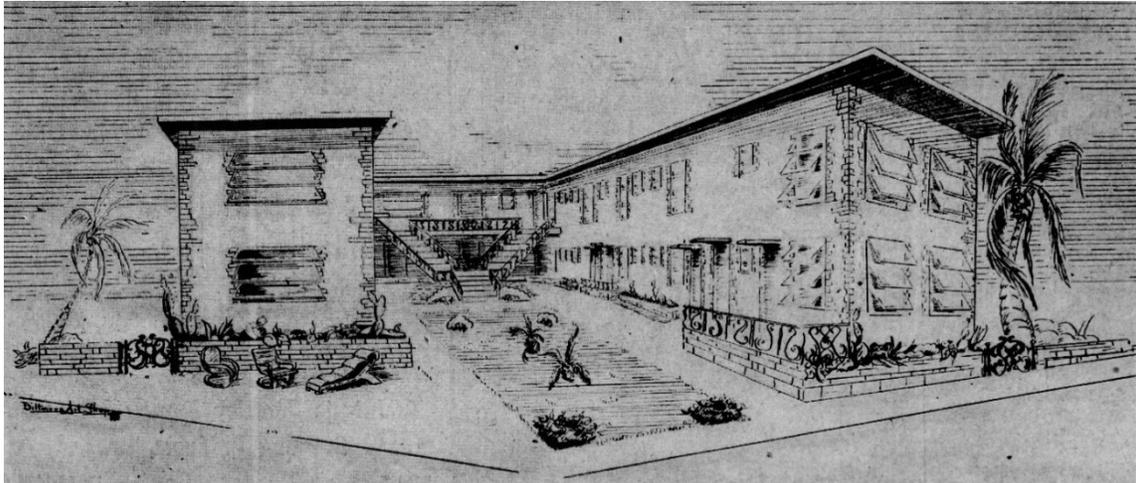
Rendering of apartment building at NE 1st Place, between 83rd and 84th Streets, Miami, 1949. (Miami Herald, 8/21/1949, p.57)
